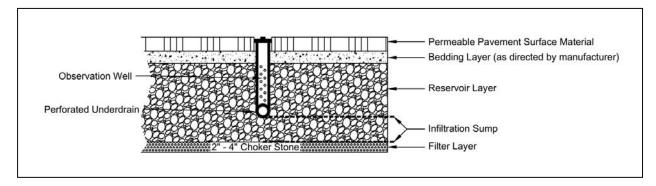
Cross-section of an enhanced permeable pavement design with an underdrain.
